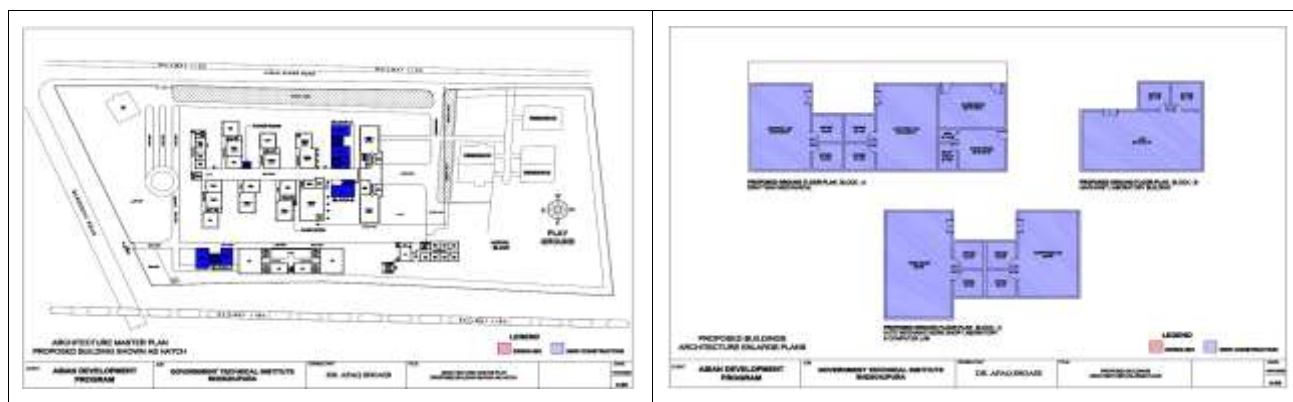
A: Designed layout of new building blocks in GTTI, Sheikhpura
